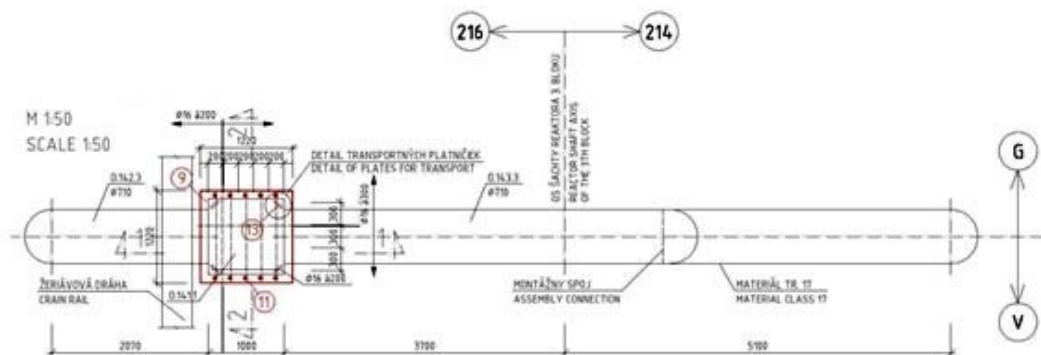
Section 1-1 of upgraded steel box by steel plate 50mm - pipe hermetising 0-141 [13]
